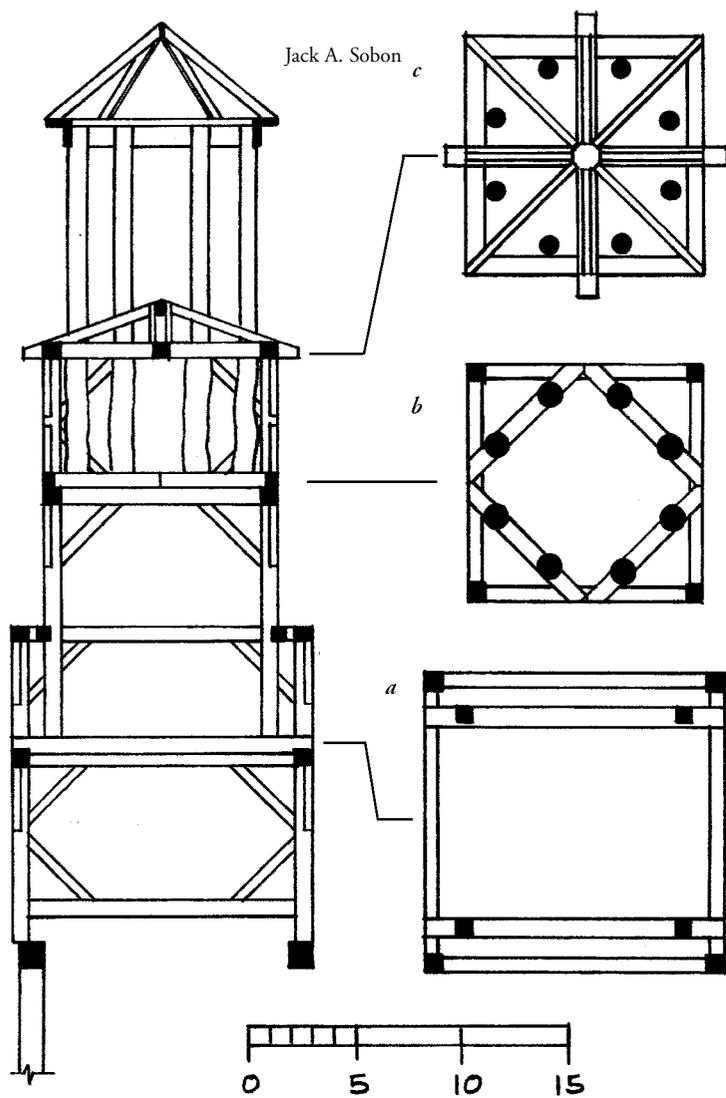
South Woodstock steeple frame section seen from inside looking toward eaves of church. To form first stage, tower posts rise from tie beam in front wall of church (at left in drawing) and tie beam in first roof truss. To form second stage, posts rise from sleepers resting on girts 6 ft. down within first tower (plan view a) and reach bell deck (plan view c) 18 ft. above, intersected about halfway by horizontal framing (plan view b) to support feet of eight columns surrounding bell. Original columns were lathe-turned where they could be seen in belfry, left in the rough where concealed. Compare Fig. 14 on page 11.
